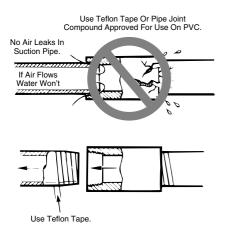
Use Teflon tape or Plasto-Joint Stik on pipe joints and connections to pump
